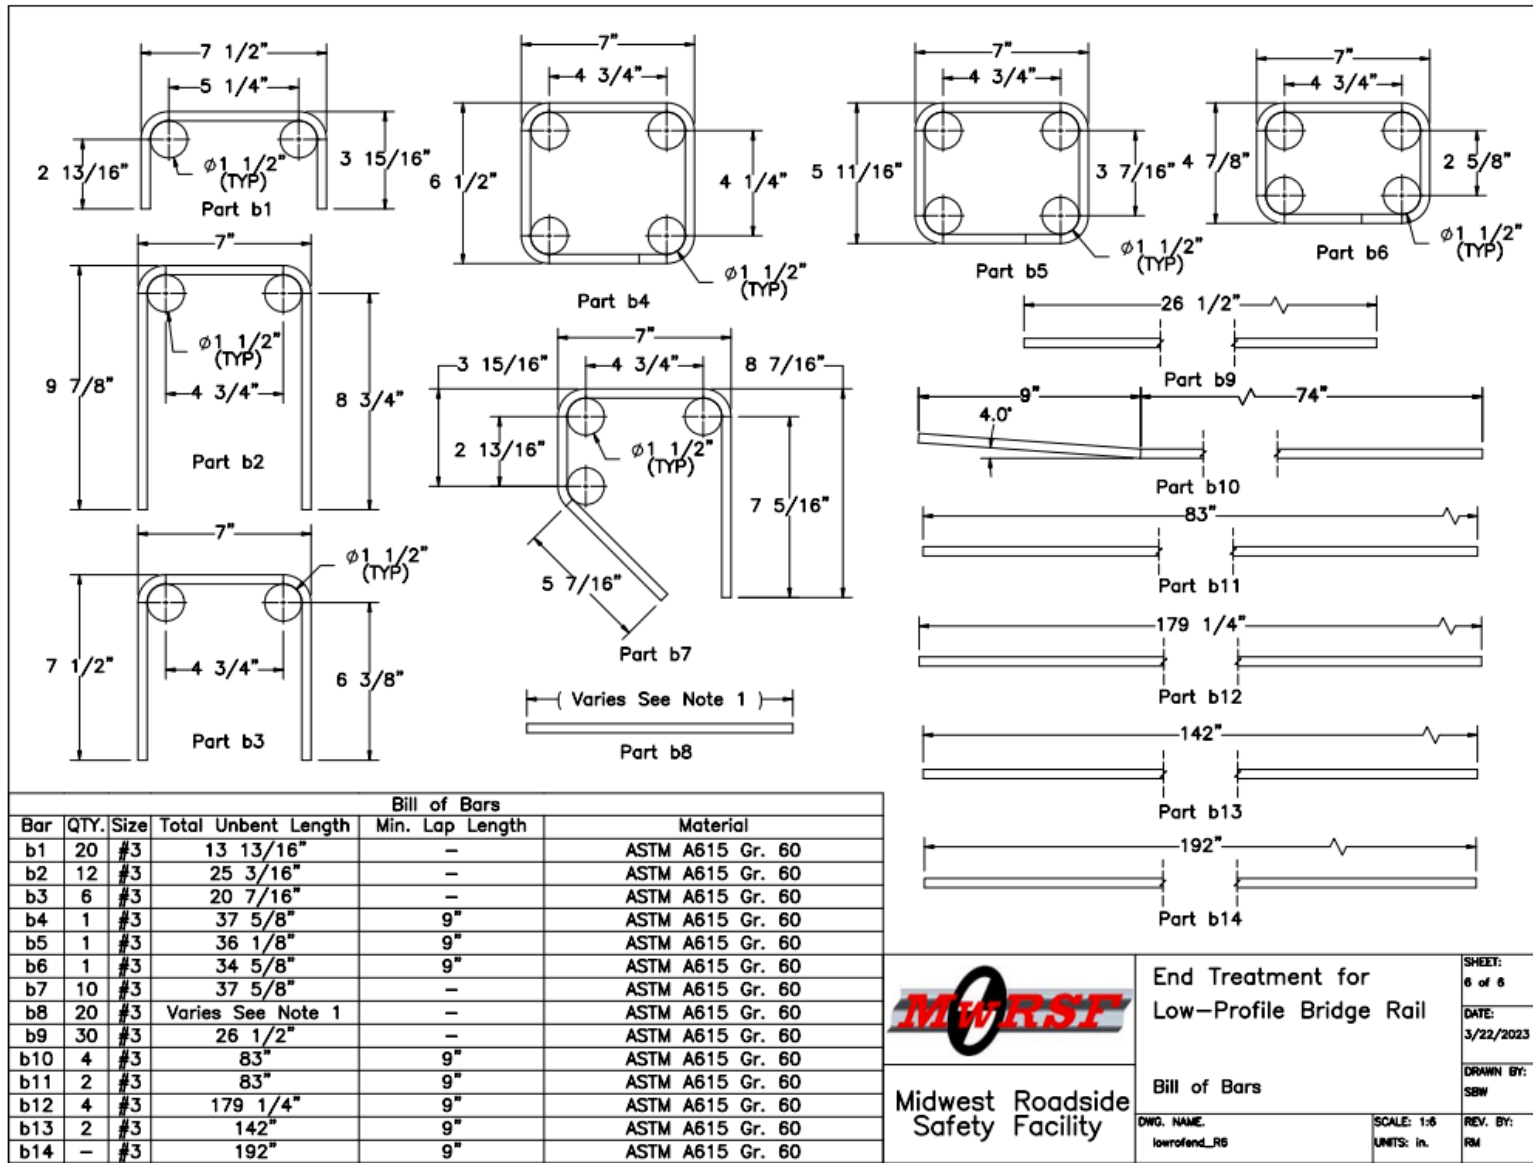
Modified NDOR Bridge Railing System, Bill of Bars
